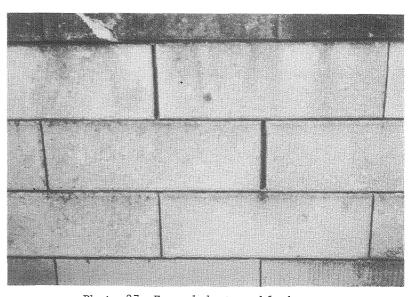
Expanded stone block wall at Togoshi in Naruto town
